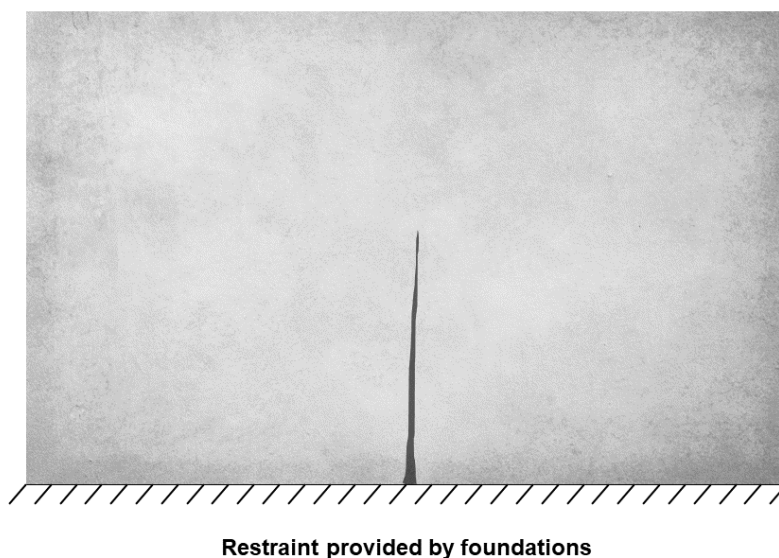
Typical vertical cracking in a concrete wall due to hydration heat development and subsequent restrained contraction (adapted from Day & Clarke, 2003:4).
